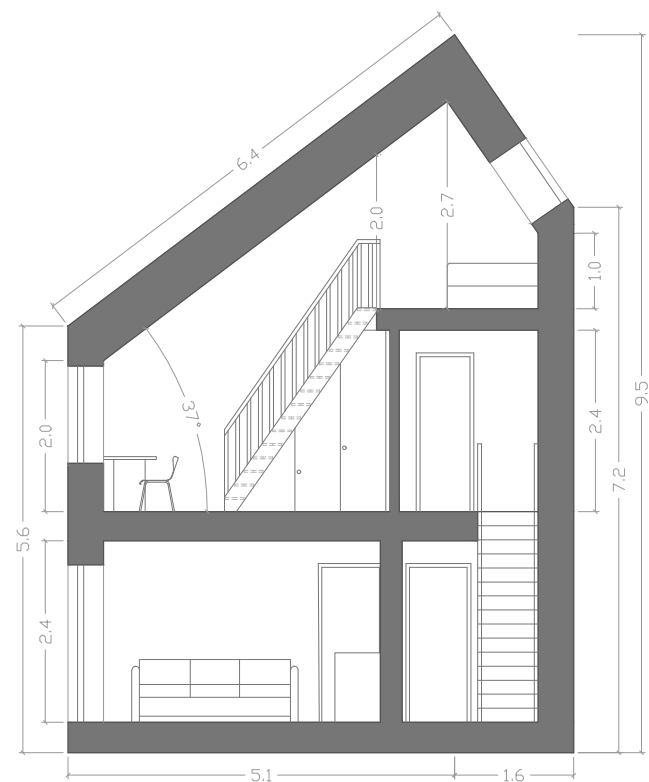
37-DEGREE ROOF SHAPE, SCALE 1:100
